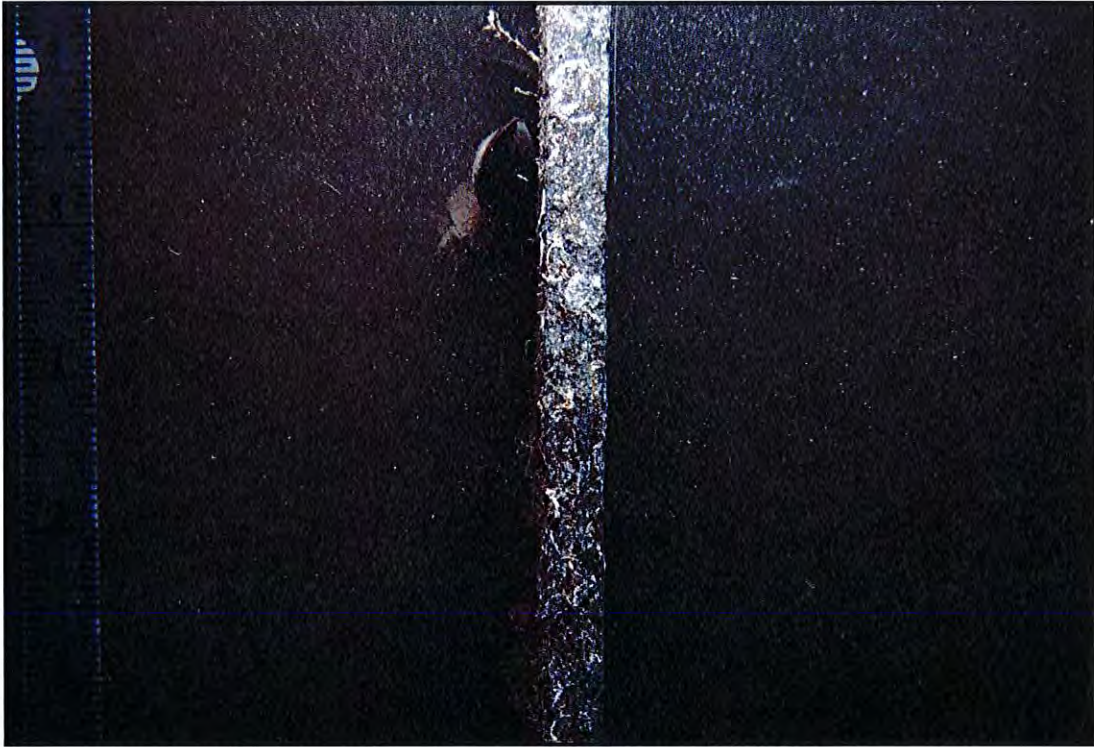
Typical condition of the flange edge of a H-pile graded Minor. H-pile location at Bent S-bar and Pile Row 19.
